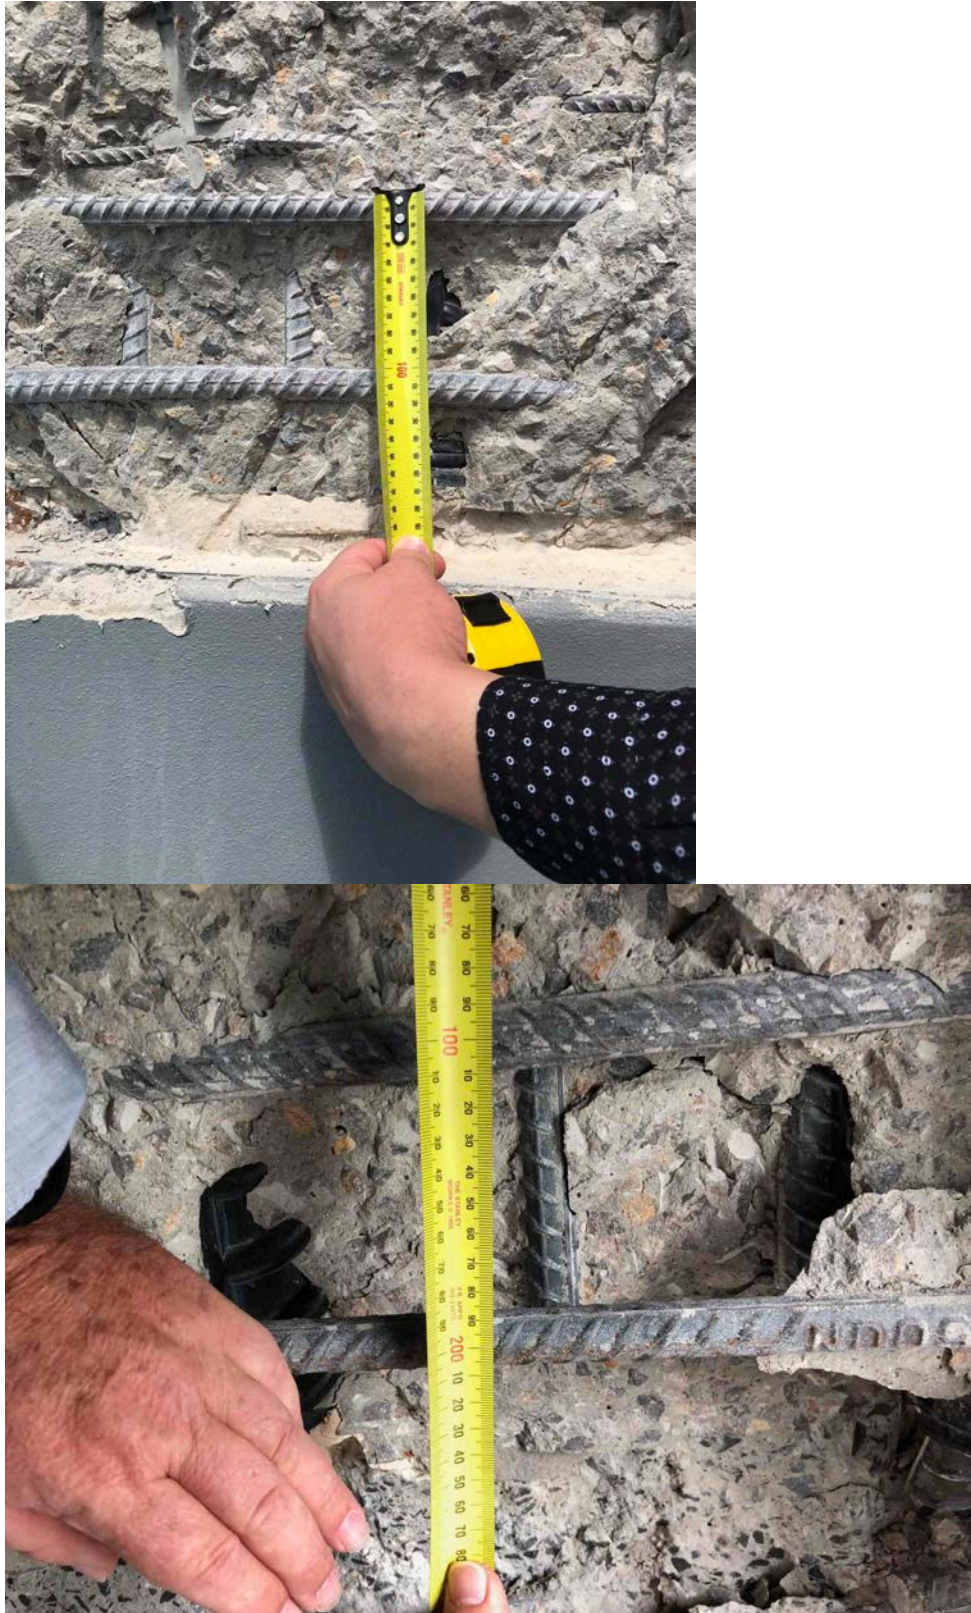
Photographs of the outside (top) and inside (bottom) of panel A at Level 10 just above hob beam adjacent to column 21, indicating N20 reinforcing bars at 100 mm centres in the lower portion of the precast panel. Note the exposed grout between panel A and the hob beam and the black plastic sheath for the joining dowel (top photo, right of tape measure).
